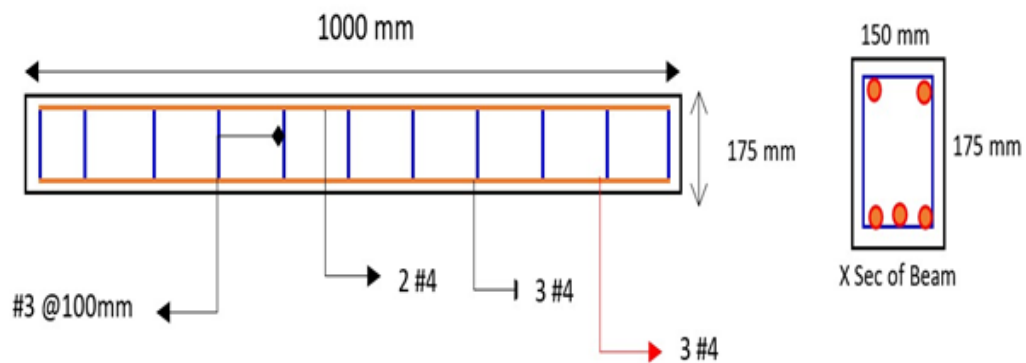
Geometry and reinforcement of 12x Specimen RC Beam
